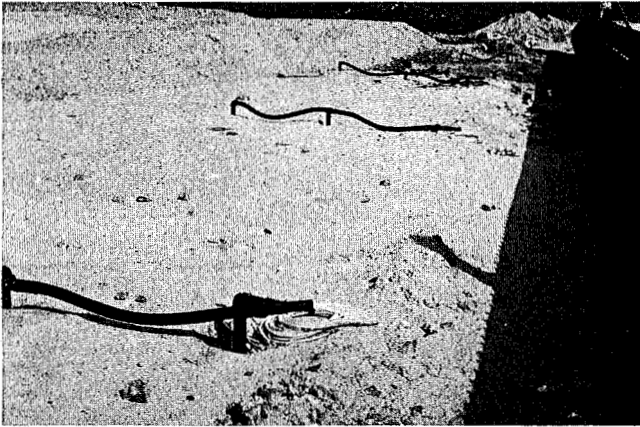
MIT-MDPW Test Section Instrumentation, Station 246
